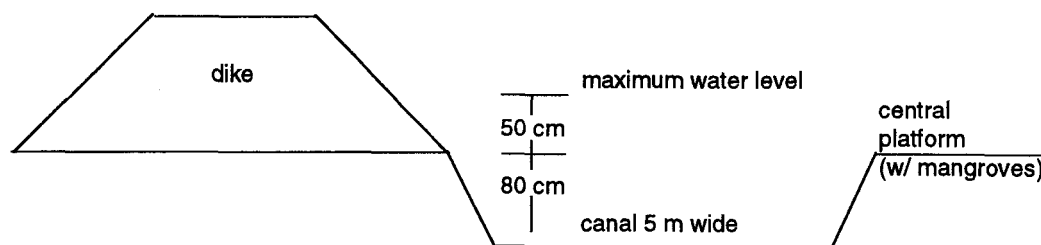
Cross section of “empang parit” pond at Sinjai, South Sulawesi
